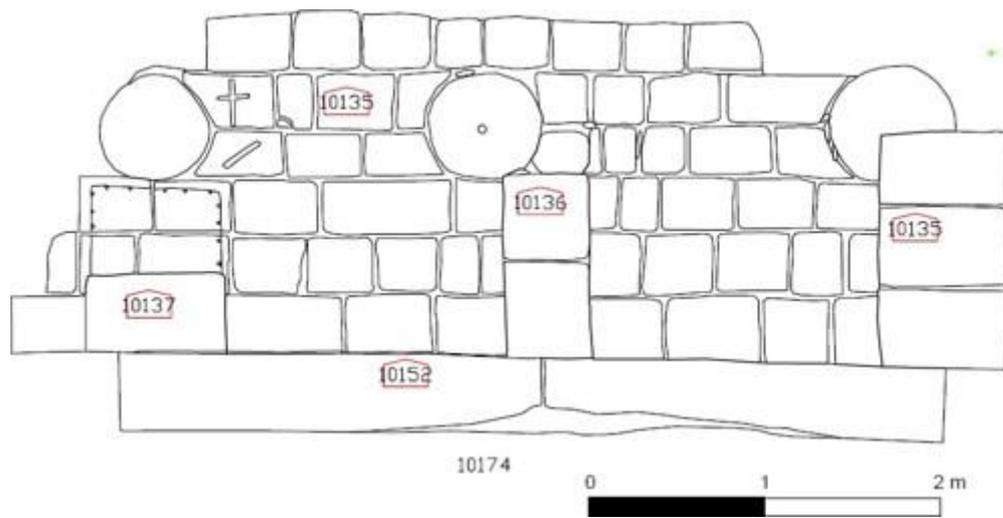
East-facing elevation of wall 10138, showing marble columns re-used as headers and possible masonry marks on two faced blocks (adjacent to left-most column in drawing). Original image: Doumet-Serhal, 2016: 11, PL. 6. Reprinted with permission from the Editor, Faculty of Arts and Sciences, American University of Beirut and the author Claude Doumet-Serhal.
